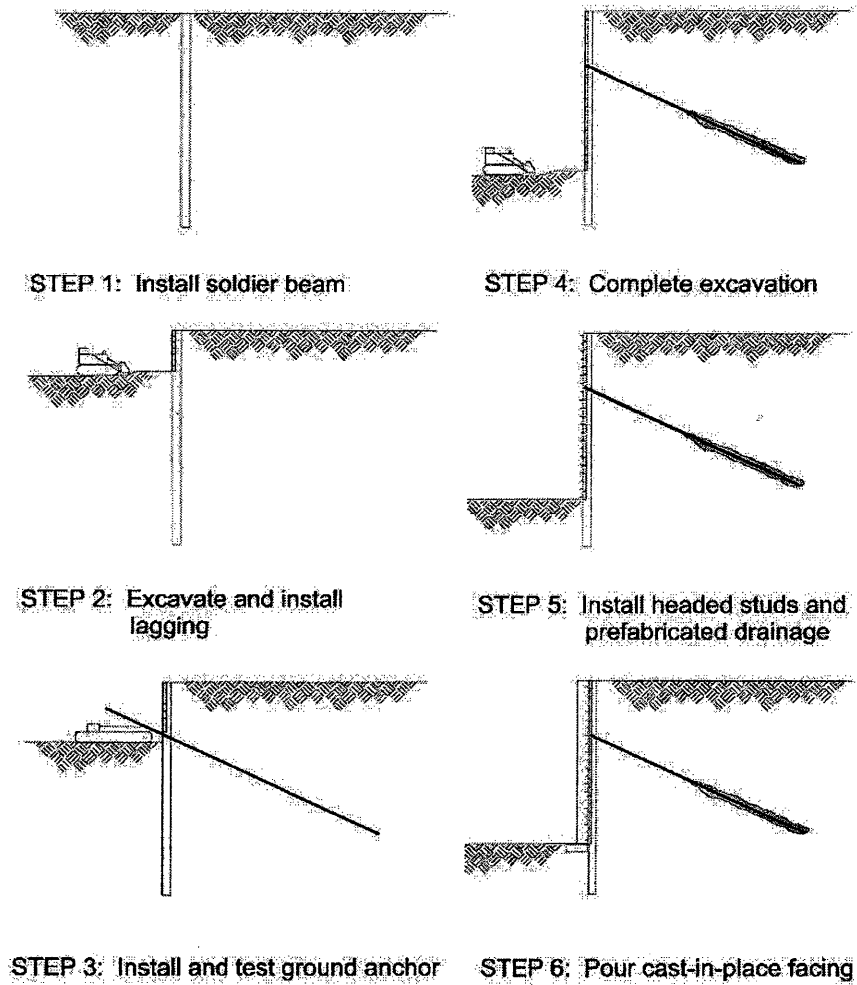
Soldier beam and lagging retaining wall construction sequence (Sabatini et al., 1999)
